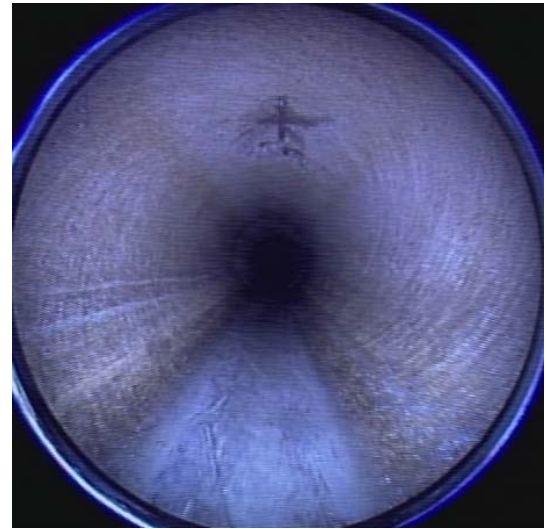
(d): Exposed Reinforcement – RC Pipe
